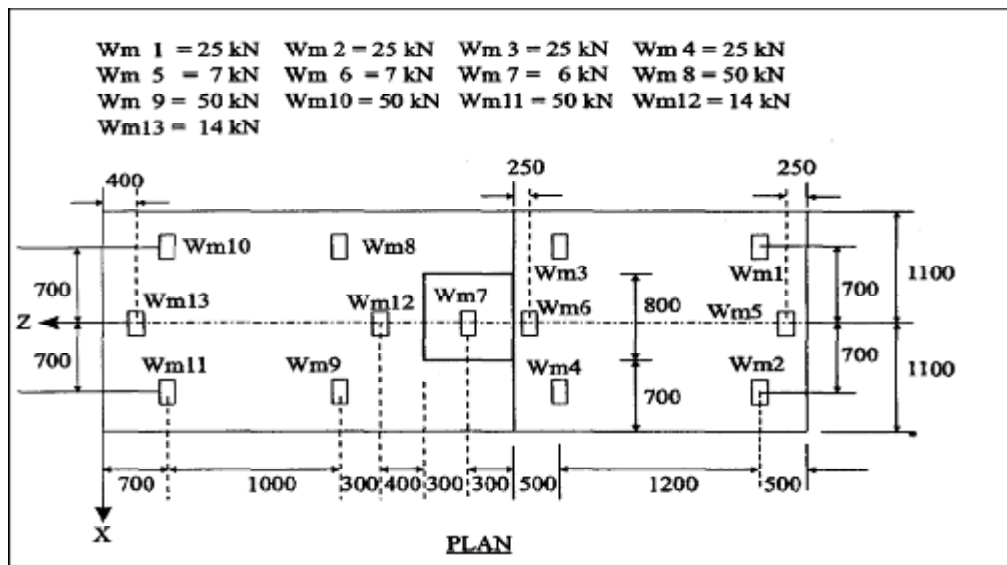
Details of machine foundation of the problem (Bhatia,2008)
